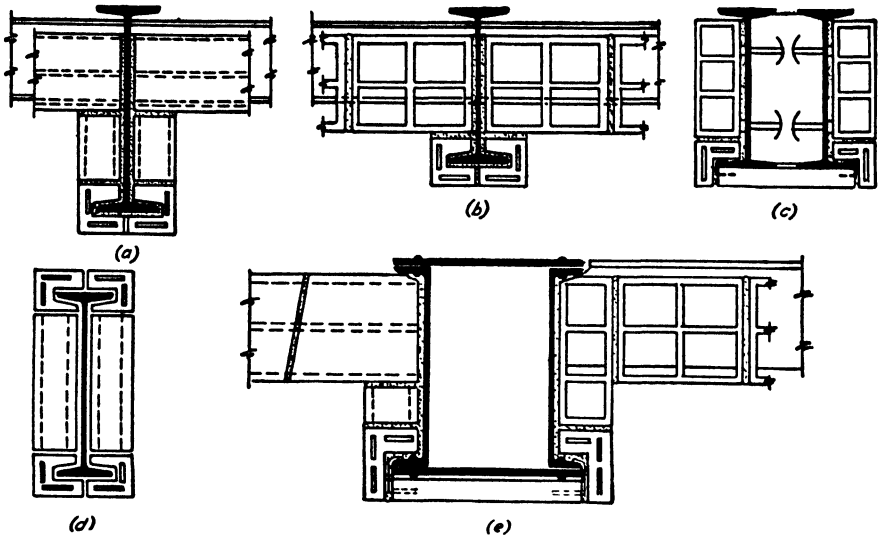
Fireproofing Structural Steel Beams. (a),(b)&(d) single beams; (c)&(e) box girders.
